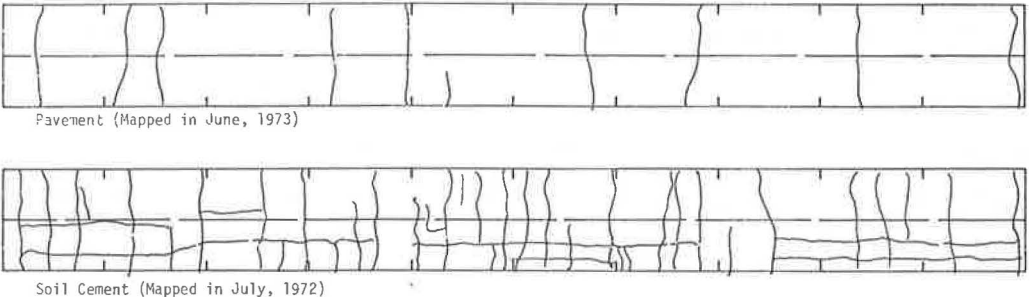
Cracking pattern of soil-cement base and superimposed pavement for experimental section with 7-day undisturbed curing period.
